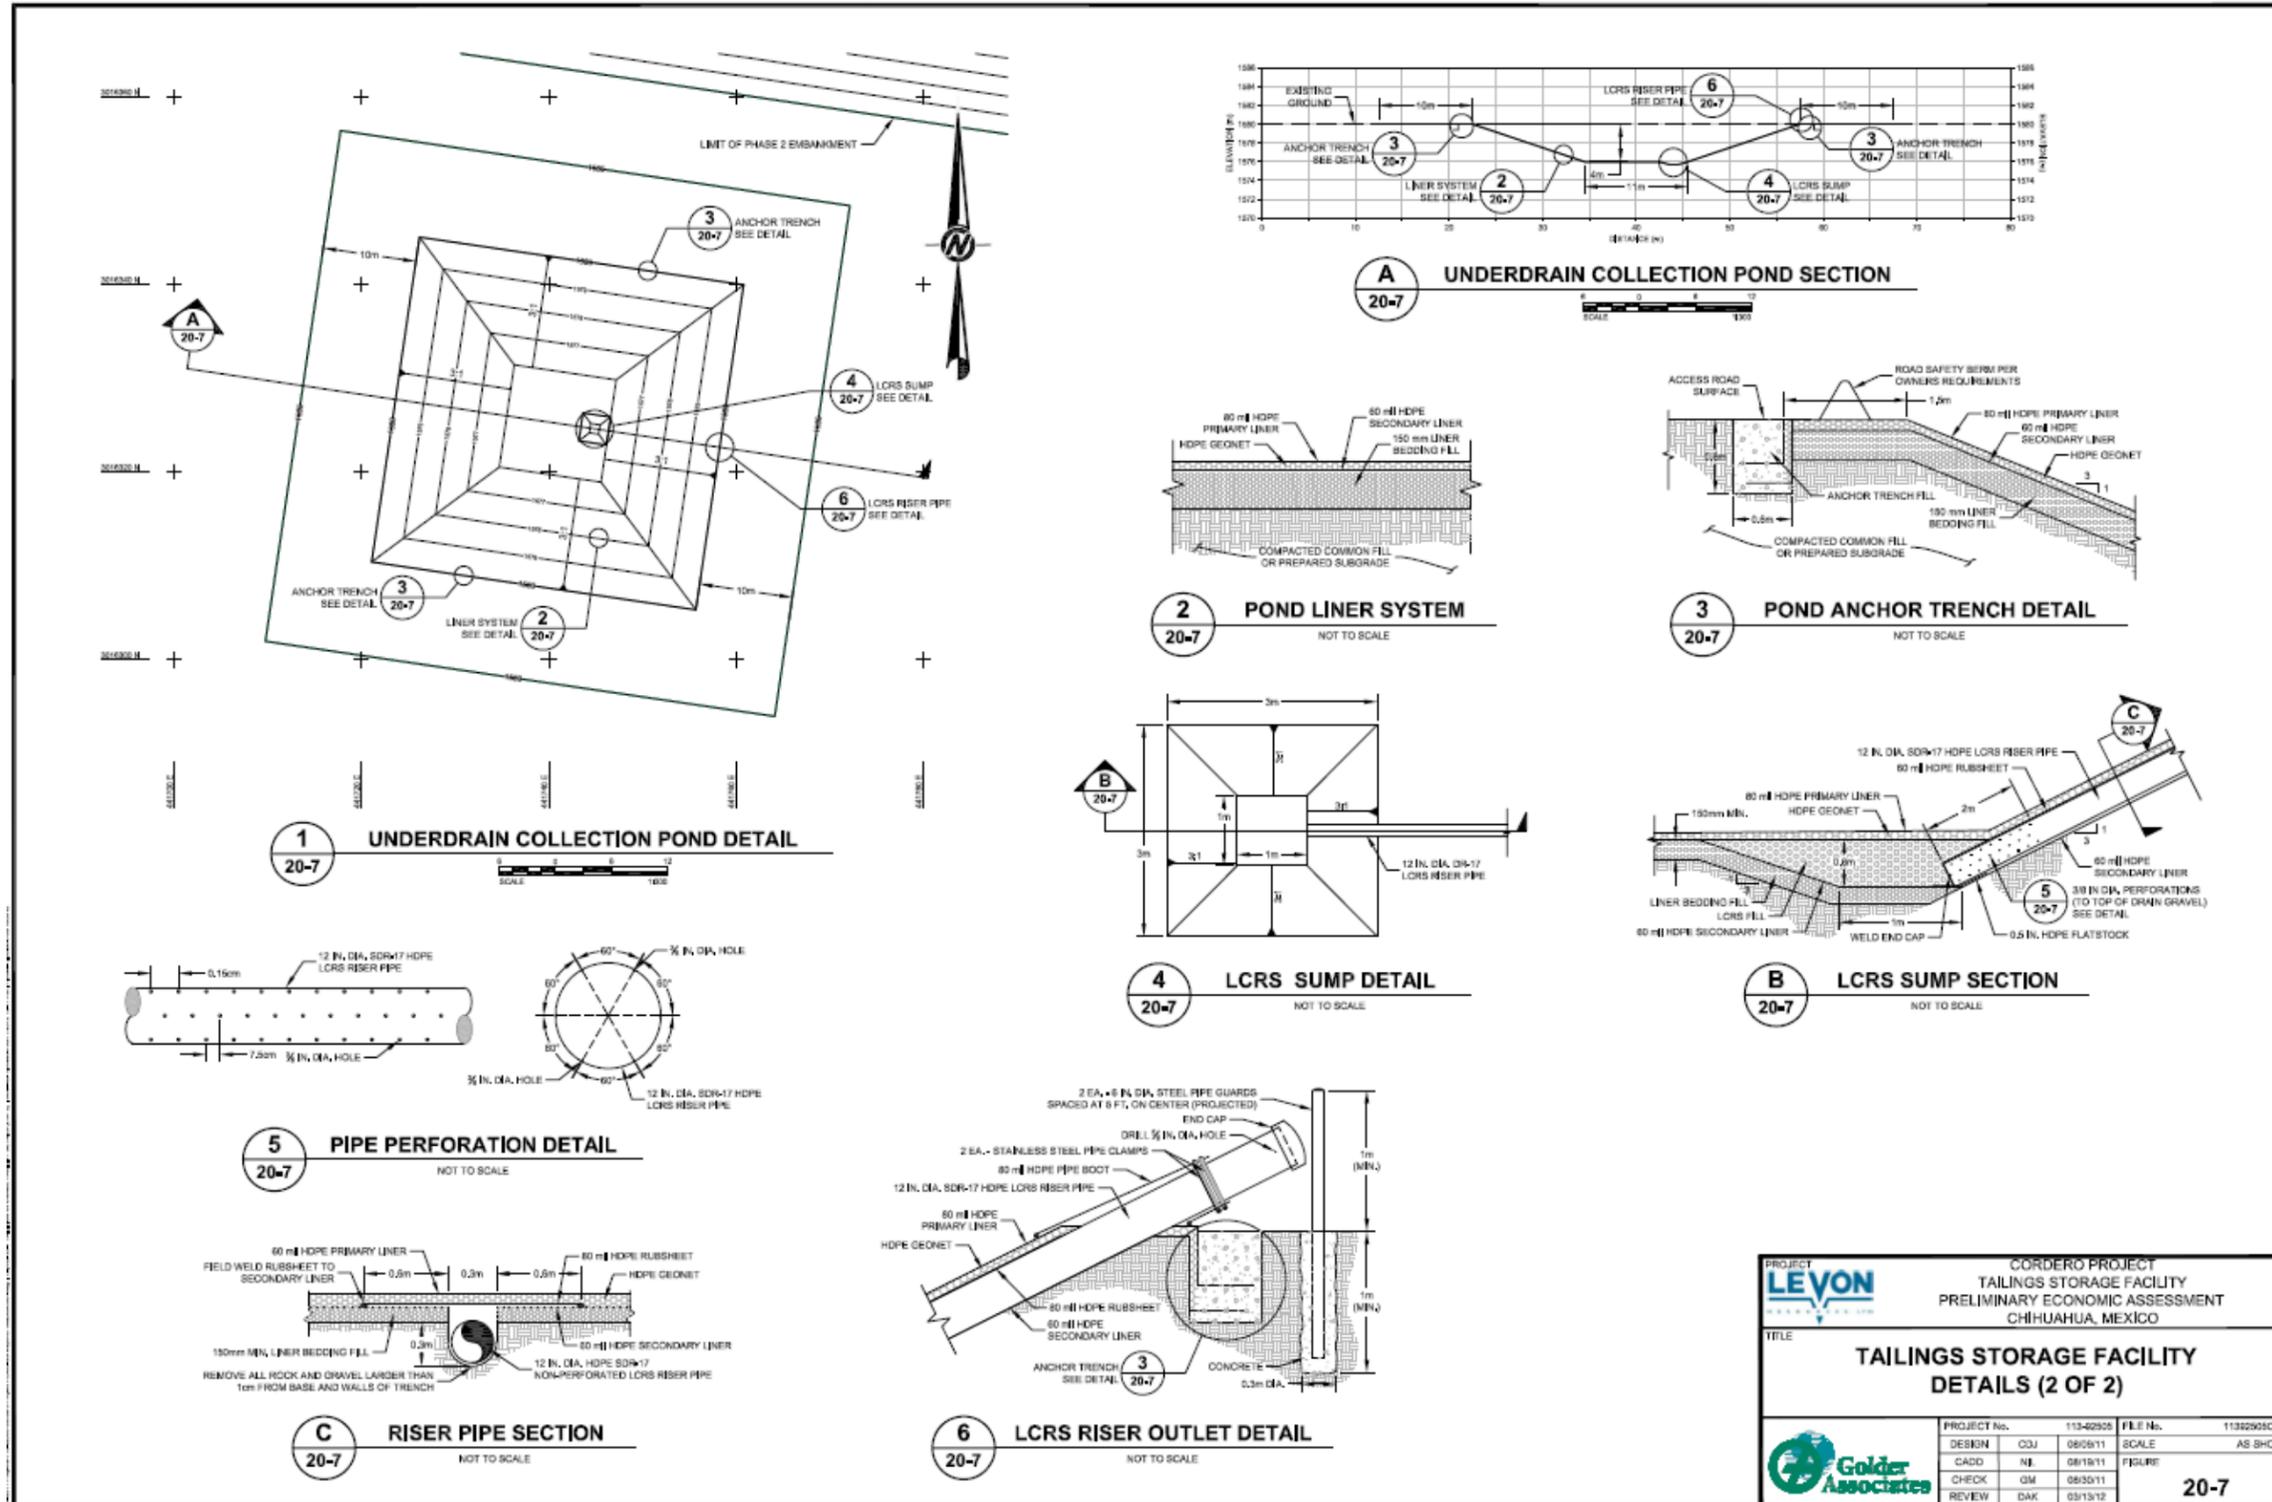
Tailings Storage Facility Details (2 of 2)
